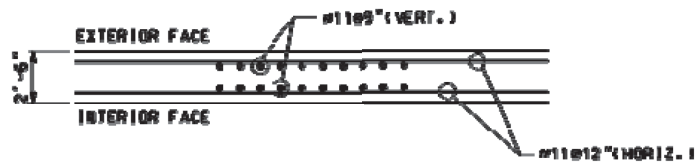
A-54 Typical Reinforcement of the EDG Building Basemat
